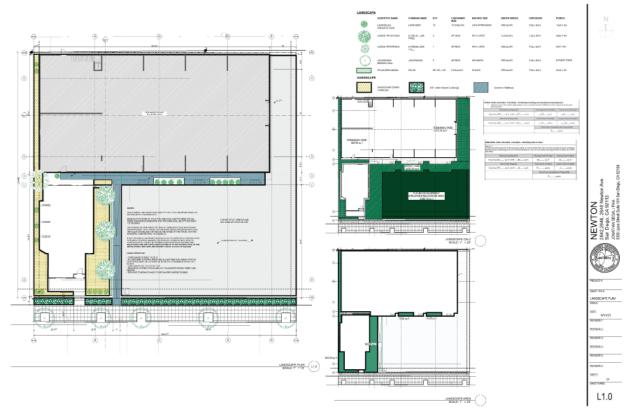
Proposed landscape plan at the Newton Avenue site. Source: Matthew Segal.
